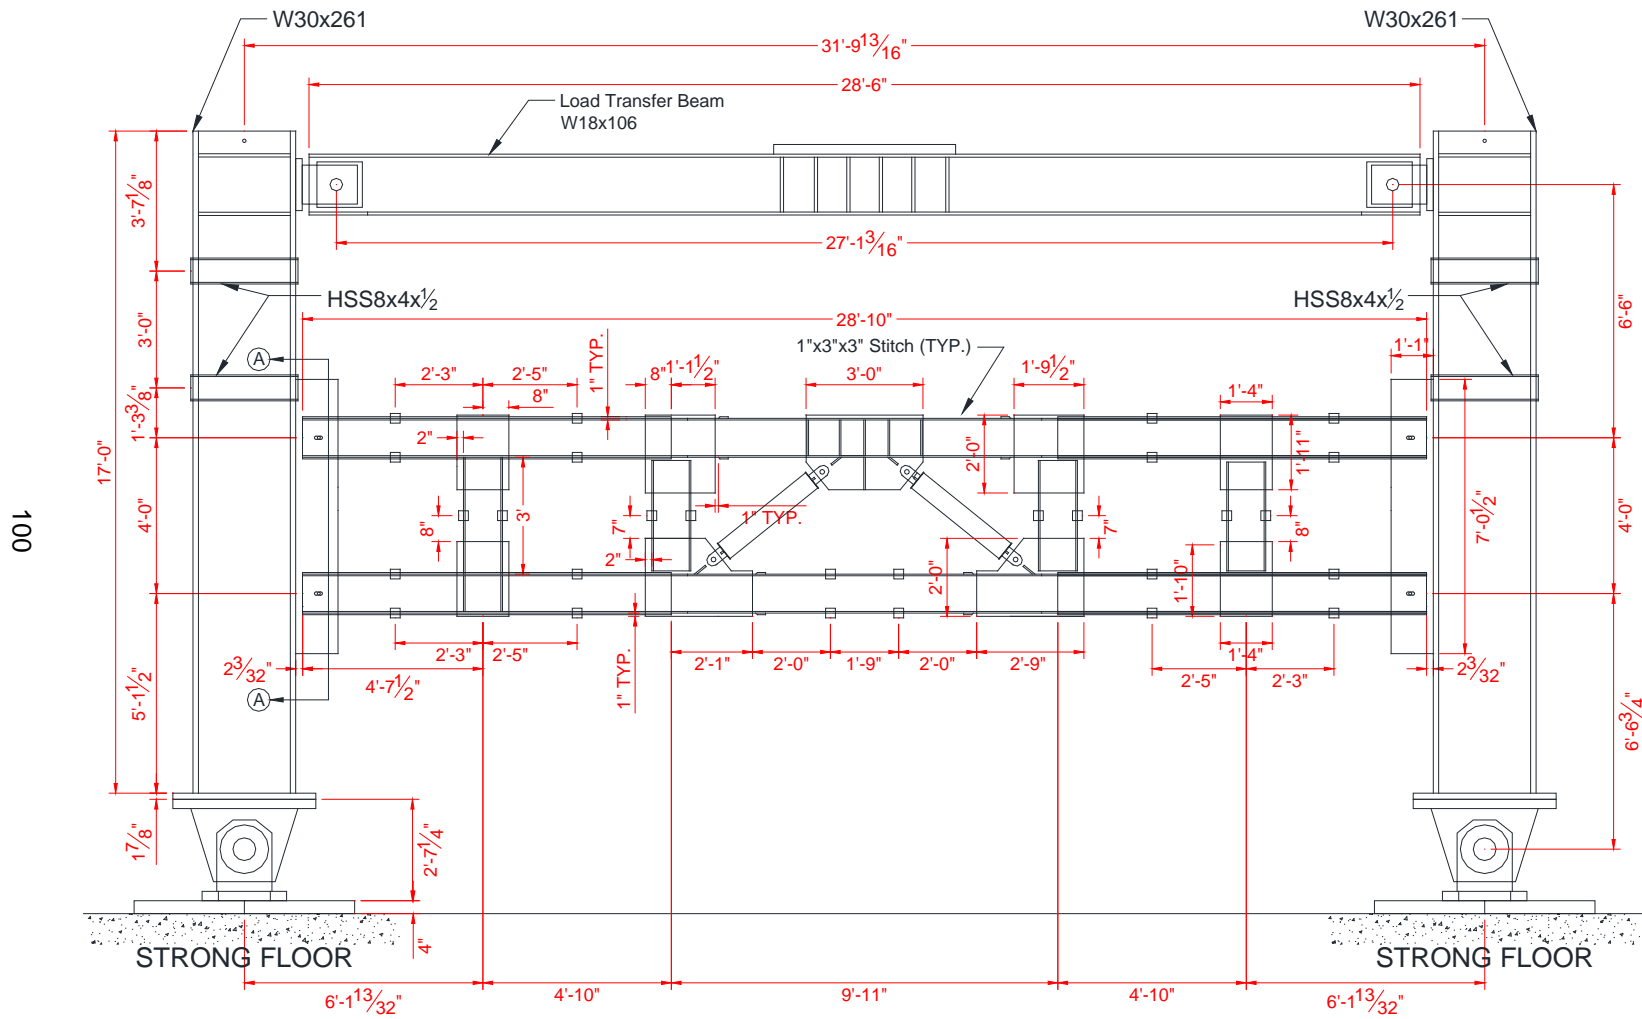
STMF Elevation without Lateral Bracing Systems
